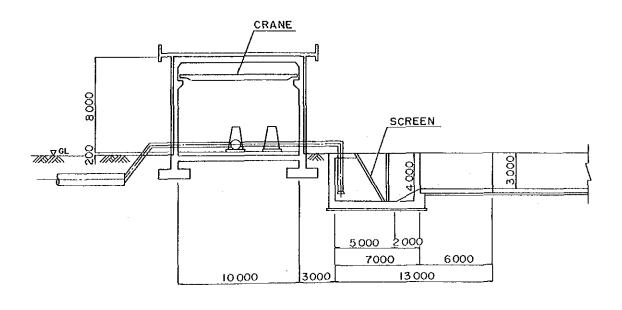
PRELIMINARY LAYOUT OF HEAD WORKS
